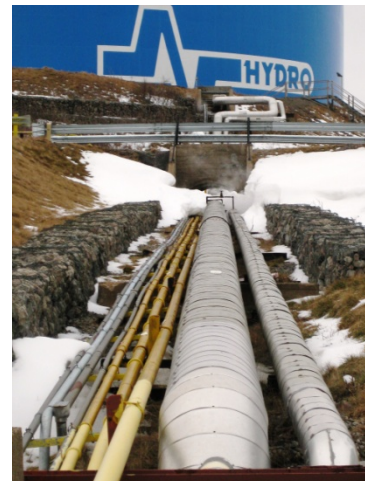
HEAVY OIL – PIPING FROM STORAGE TO POWERHOUSE
